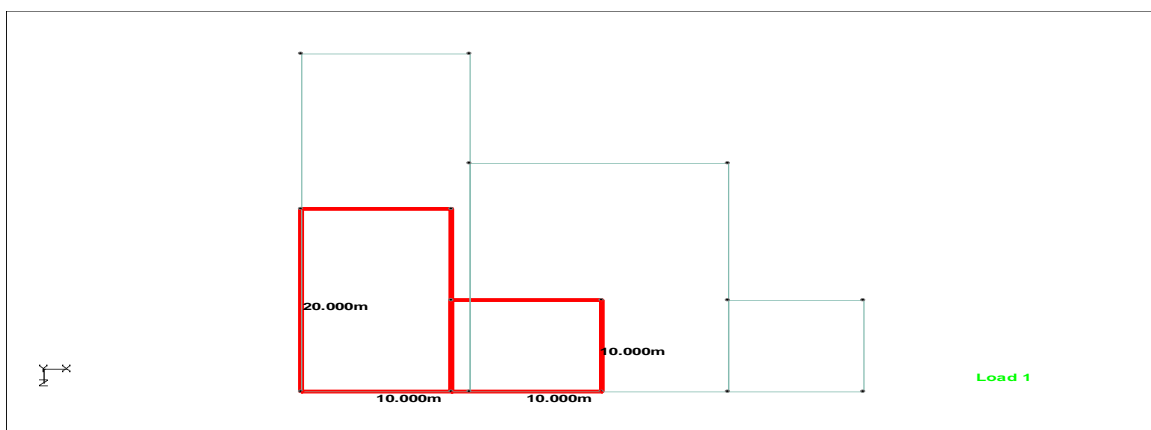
Layout plan of Model Frame 3 (Two sided swimming pool at corner)
